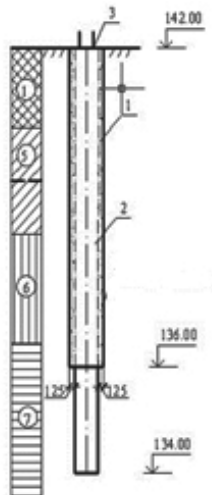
Composite pile diagram: 1 – soil cement shell, 2 – cast-in-place reinforced concrete pile, 3 – reinforcement cage.
